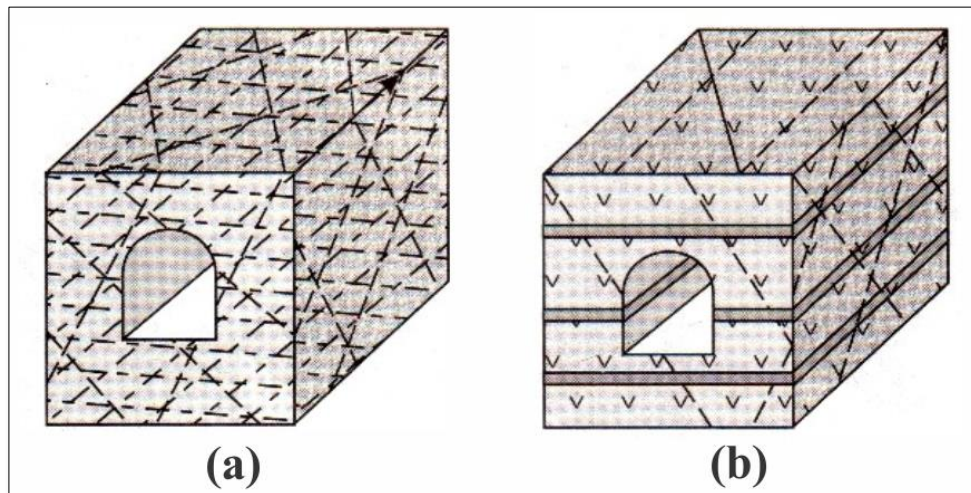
(a) A tunnel in plutonic igneous rock body, see the criss crossing joints. (b) A tunnel through volcanic rocks with horizontal flowage planes, ash beds and criss crossing joints.
